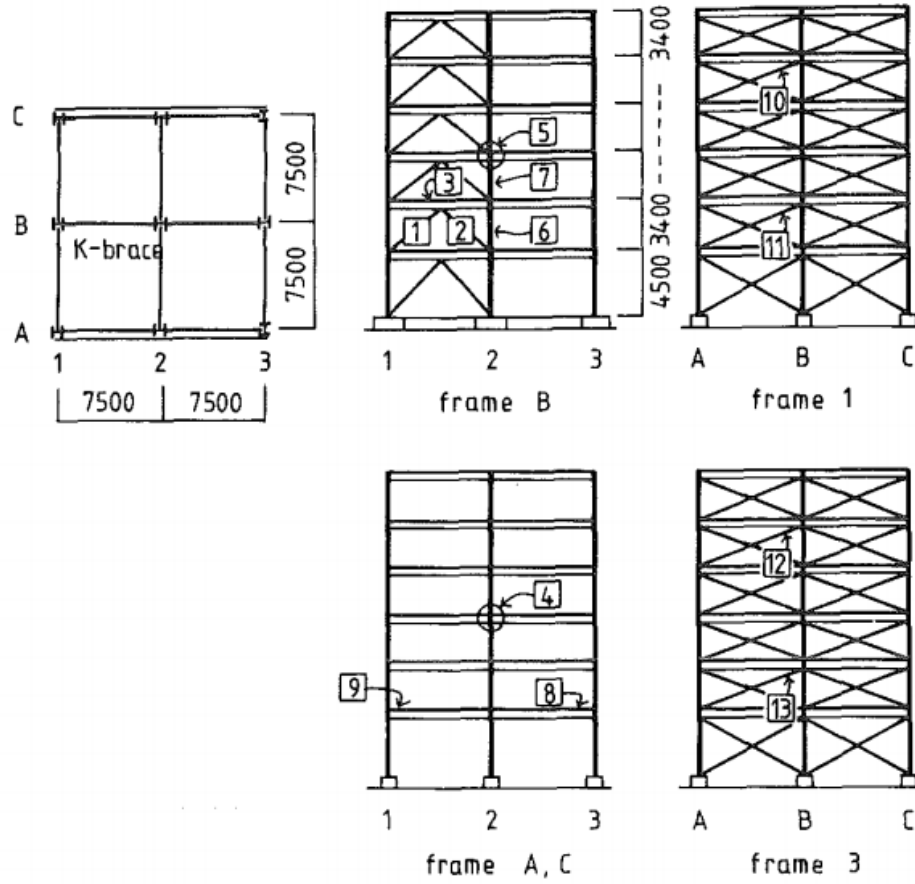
U.S./Japan 6-story test frame plan and elevations.
